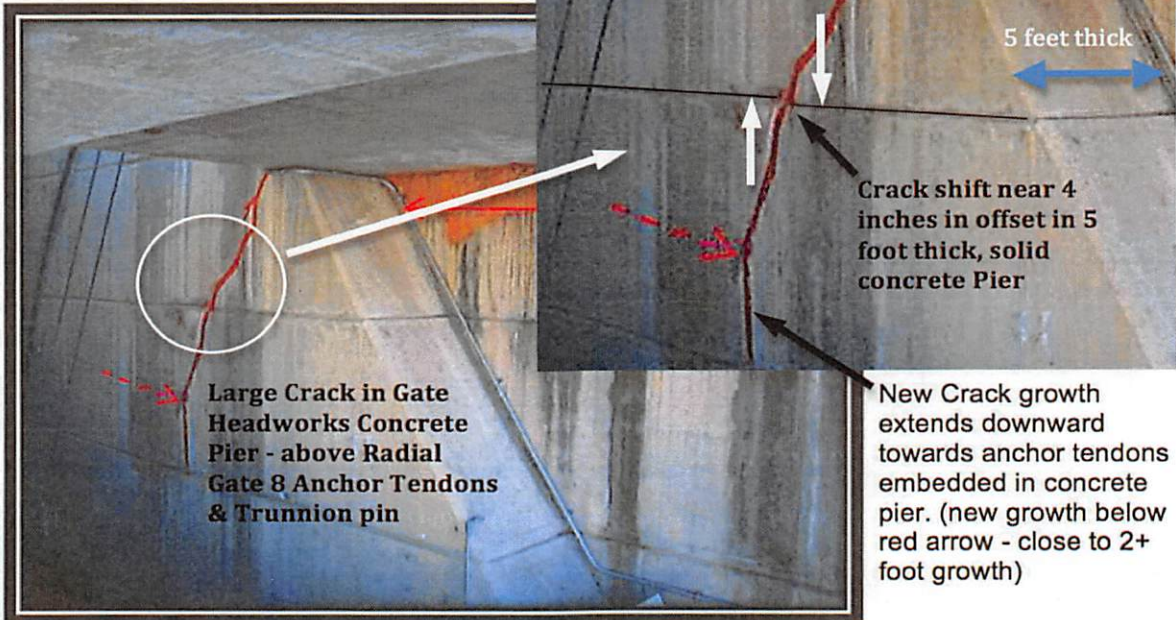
Gate Headworks cracked reinforced concrete pier support structure.
